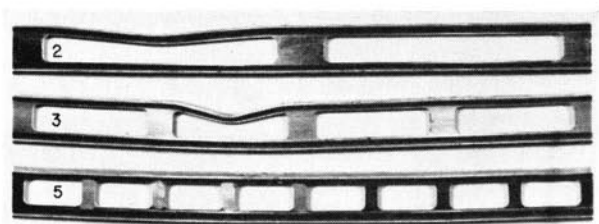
Pure Bending Failures in 3-in. I-Beams, Rectangular Cutouts
